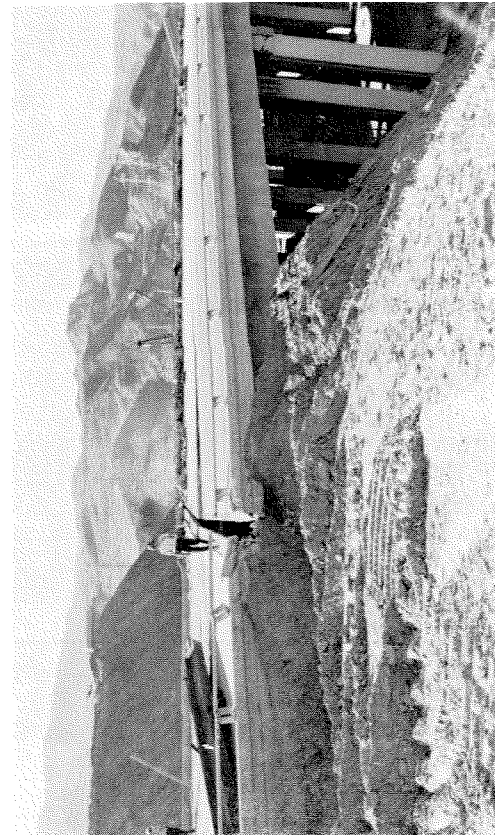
Southeast abutment, San Fernando Road overhead, Golden State-Foothill freeway interchange.
